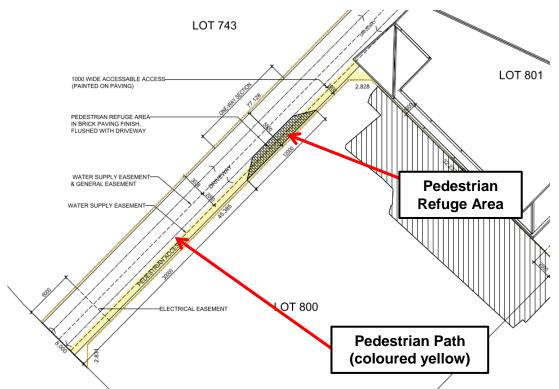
Proposed Pedestrian Footpath and Refuge Area
